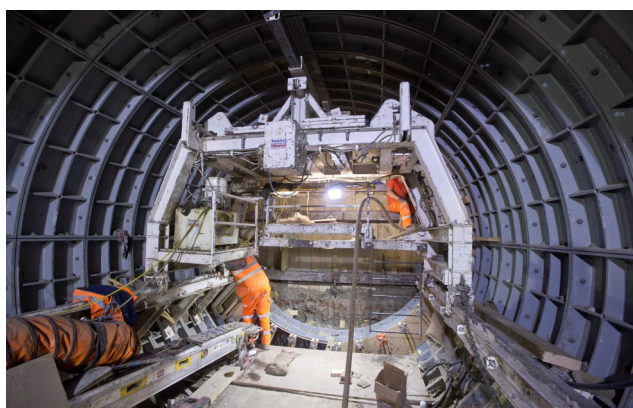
Excavation of cross passage CP6 using timber headings and installation of SGI lining.
